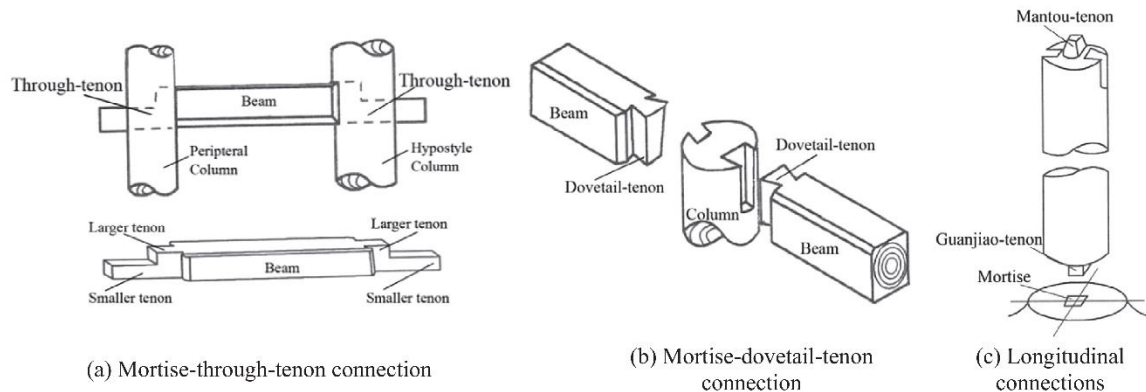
9 Typical Mortise-tenon connection (Jiayang, 2020)
